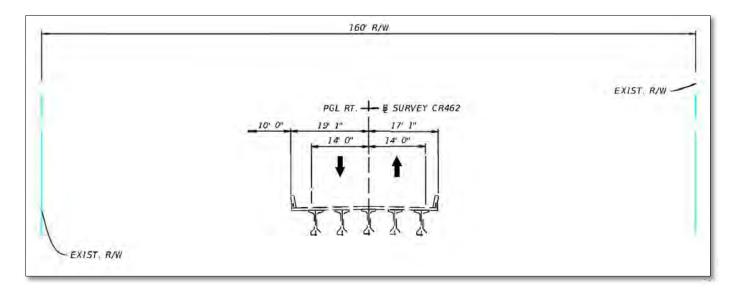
Existing Typical Section of C.R. 462 Bridge # 180047 (Over I-75)
